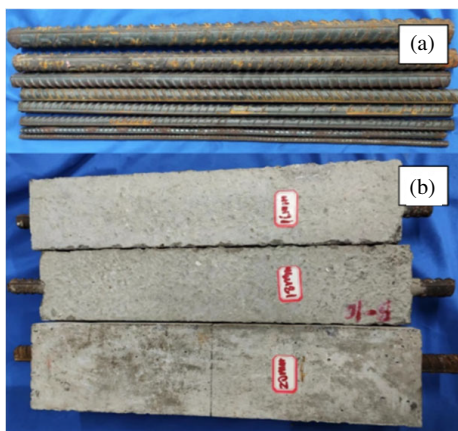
Part of the steel bar and concrete samples tested, (a) steel bar, (b) concrete.
